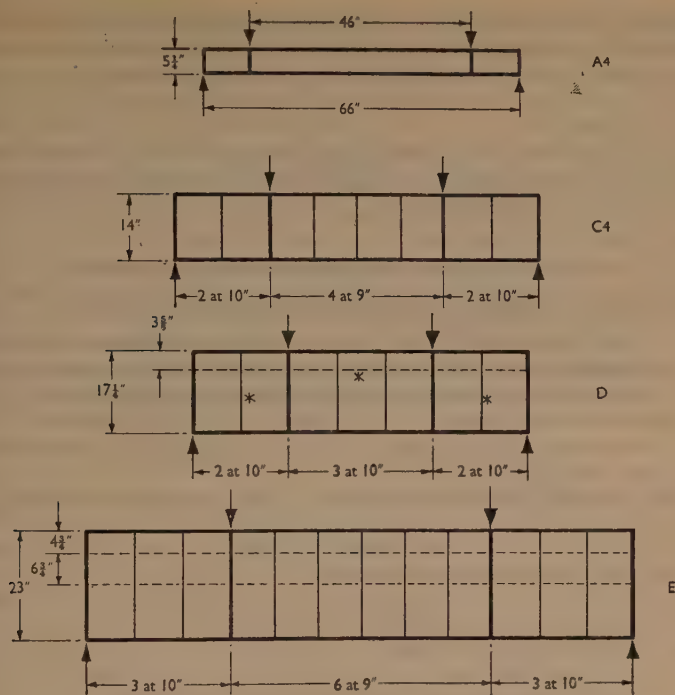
PRINCIPAL DIMENSIONS OF GIRDERS TESTED
